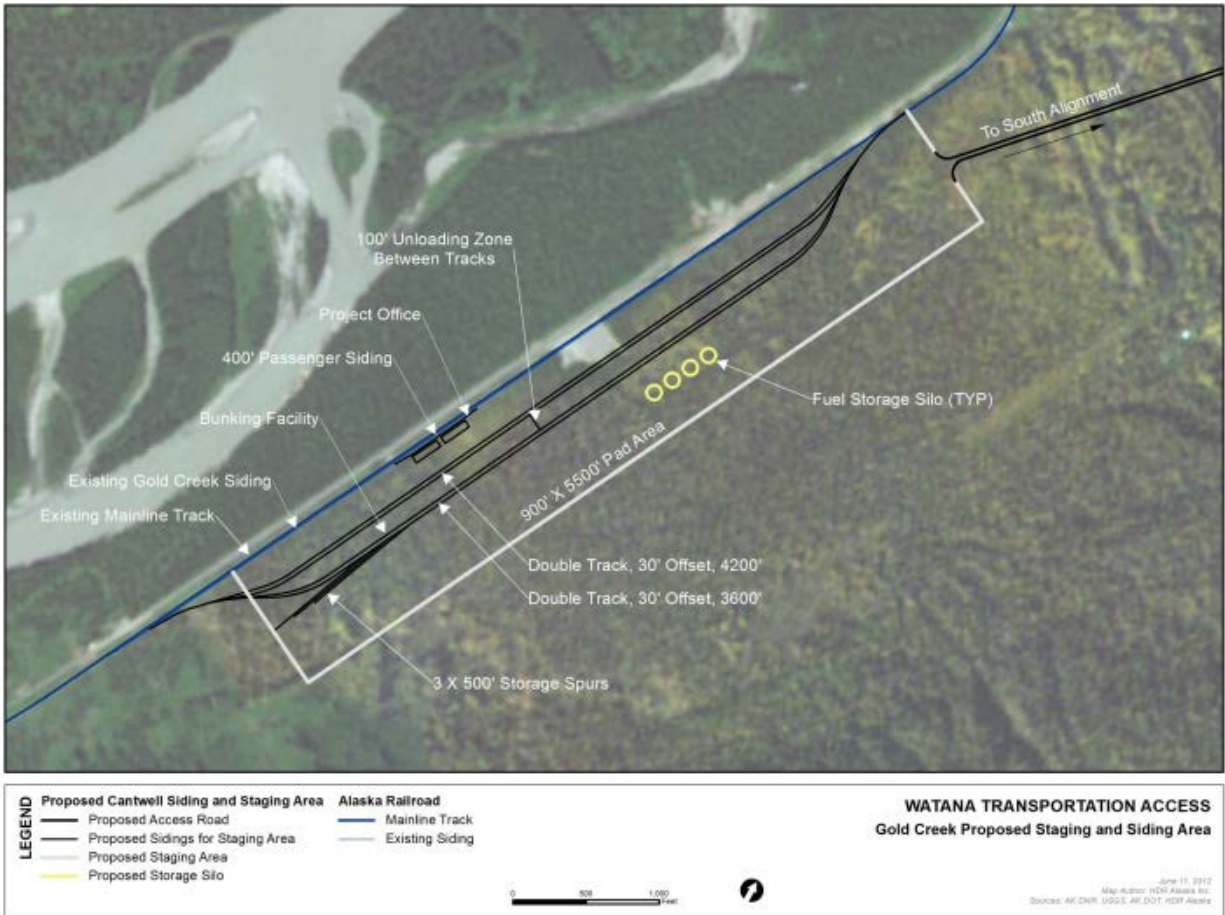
Conceptual Gold Creek railroad staging and siding area
